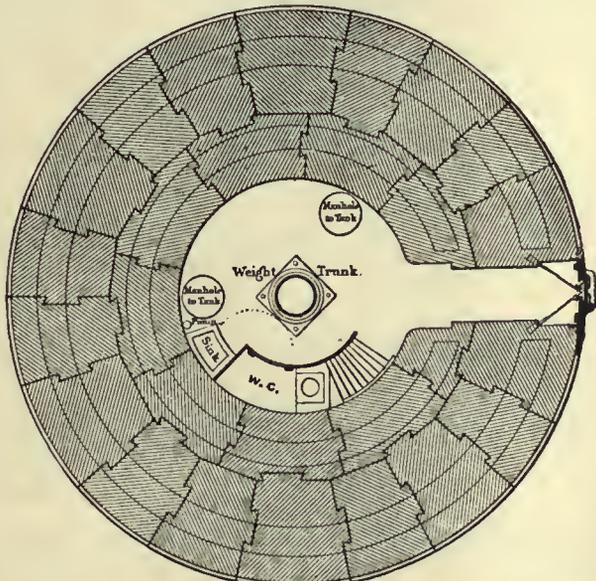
Plan of Entrance Floor, Eddystone Lighthouse.
